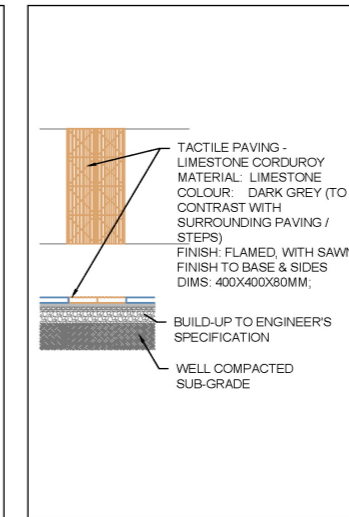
LIMESTONE PAVING SCALE:1:50
